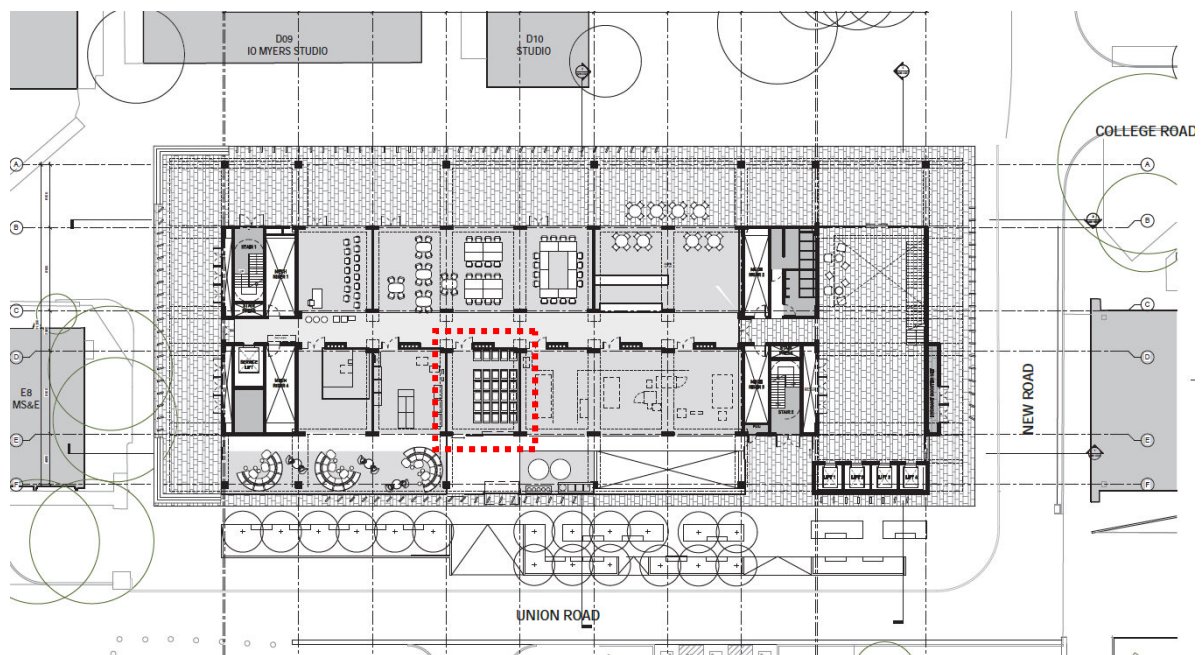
Proposed location of Bin Storage Room on Ground Floor of the new MS&EB.
